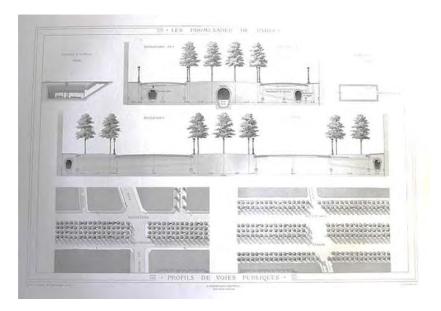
Plan and section drawings of Boulevards des Batignolles and Italies. Les Promenades de Paris. Jean-Charles-Aldolphe Alphand, 1867-73.
